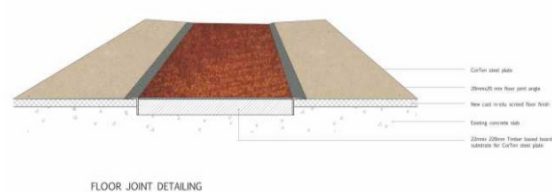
Floor joint detailing, not to scale (Author 2015)
